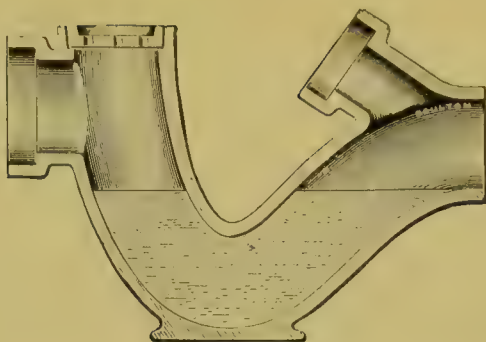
Weaver's Ventilating and Disconnecting Trap.
